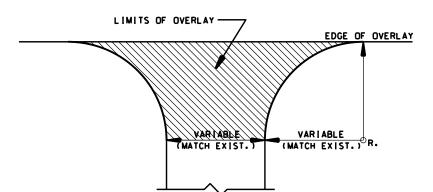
# DETAIL FOR DRIVEWAY TURNOUTS (PAVEMENT PRESERVATION)
